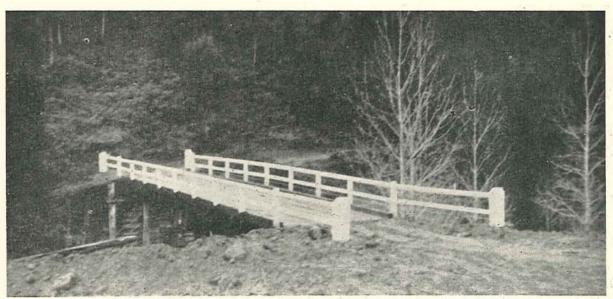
New Bridge on Beech Forest-Apollo Bay Road over the Aire River.
